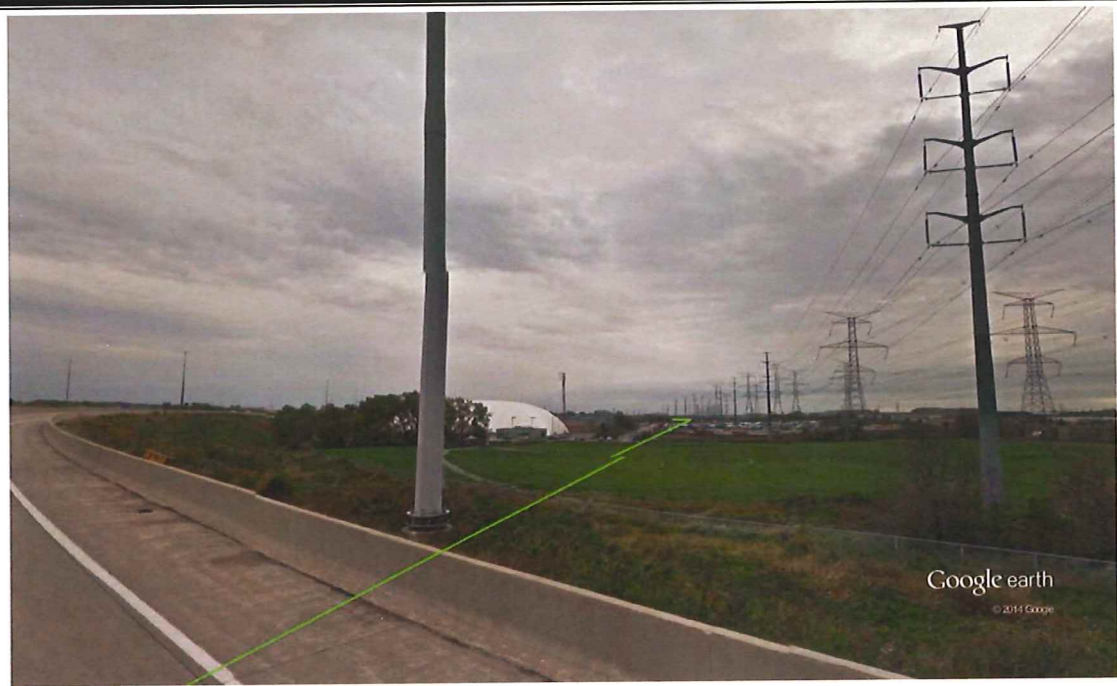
Highway 407 East exit ramp from Highway 404 North, facing east (crossing location shown by green line).
